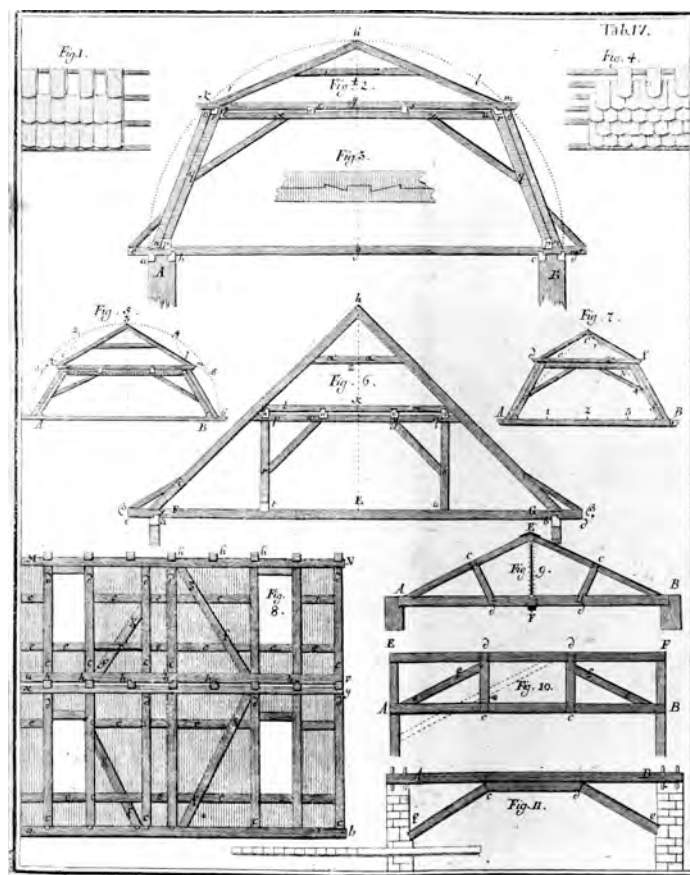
Plate from Suckow's 1763 builder's textbook showing roof frame and truss typologies, wall framing and alternate methods of tiling roofs.
